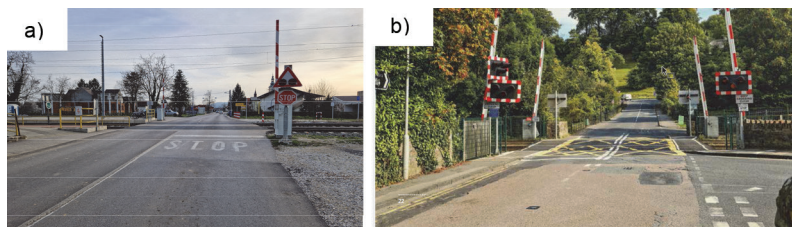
a) Crossing on the double-track railway M101 actively secured with half-barriers and other signalling (light and sound). Road elements are good, b) Crossing provided with half-bumpers and additional horizontal signalling at the crossing itself plus light and sound (British Railways) [13]
